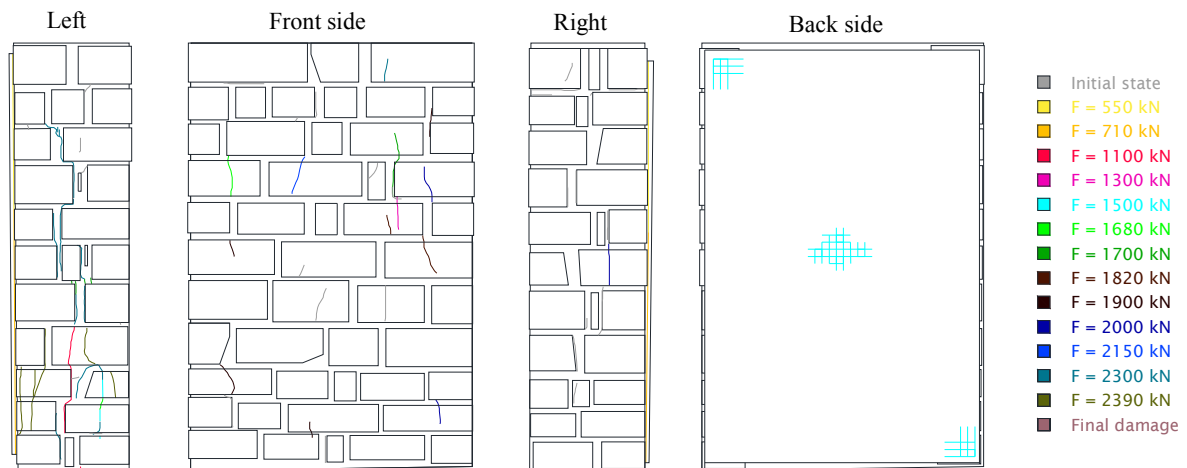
Crack pattern development on the wall without through stones and on the plaster at test TN-visoki
